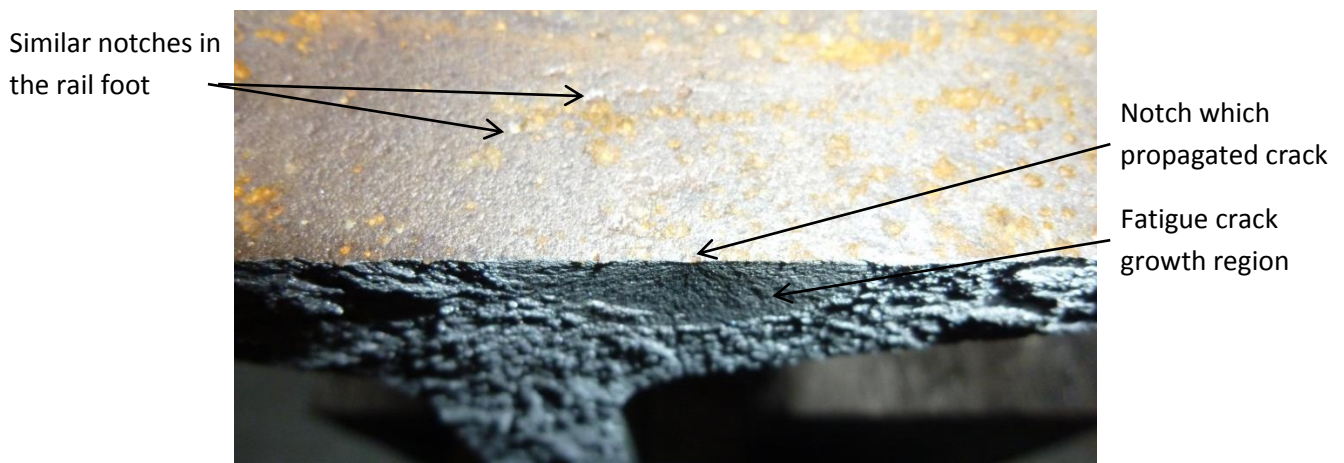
Fatigue crack in the rail and notches in the rail foot
